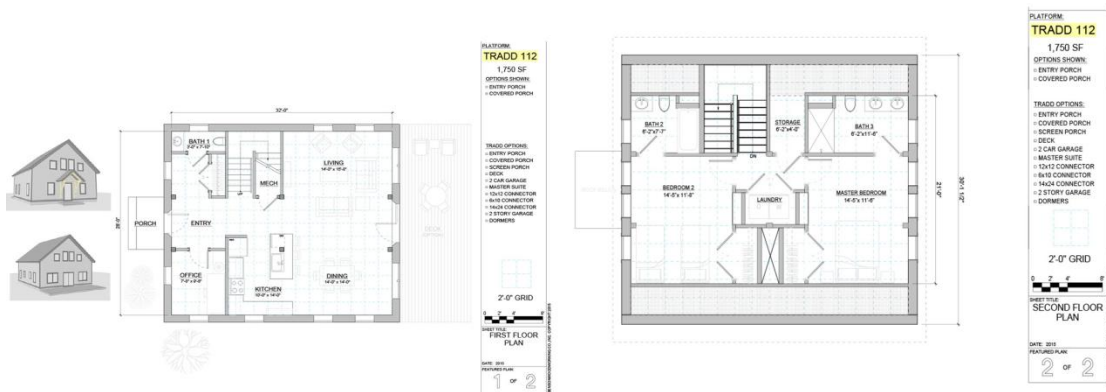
Tradd First (Left) and Second (Right) Level Floor Plans
